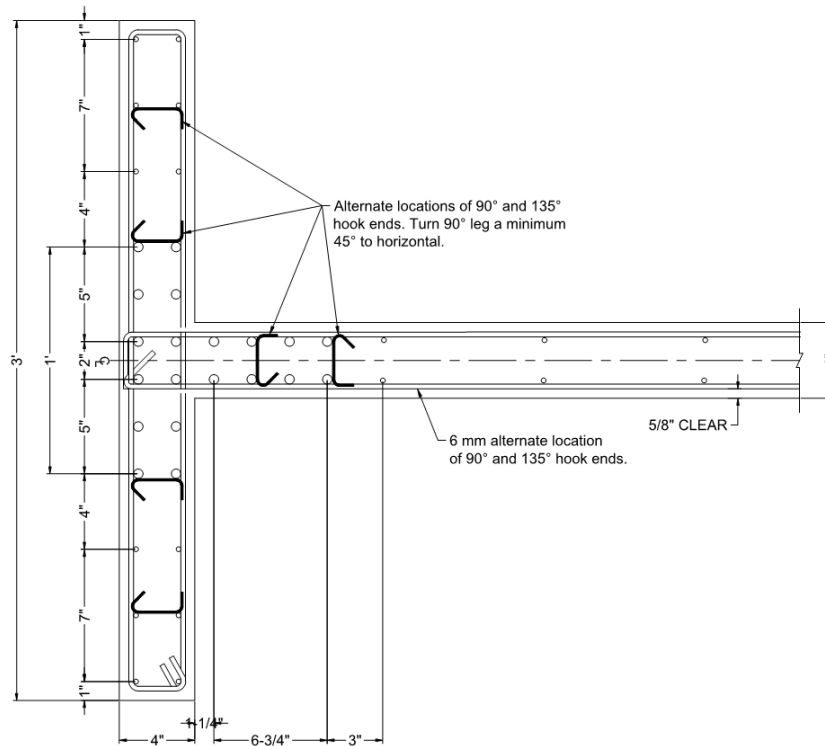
Shear Wall Specimen F2 – Cross Section (Oesterle et al. 1979)
